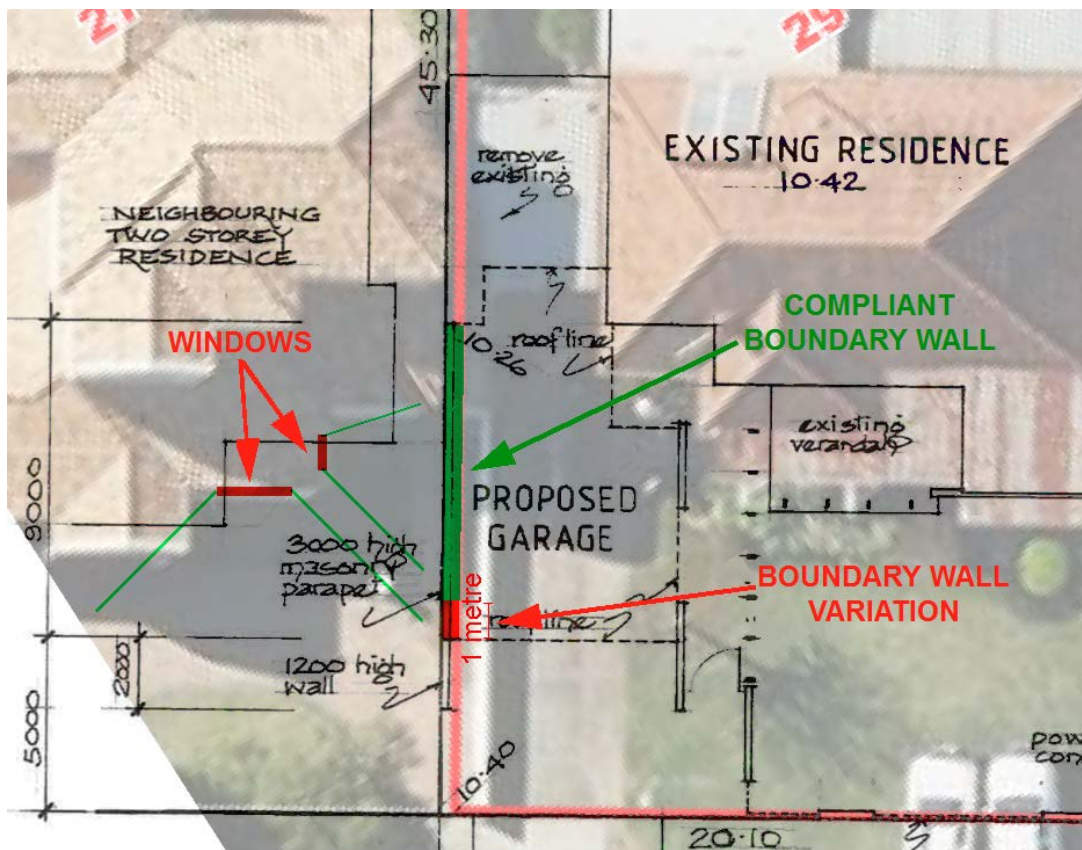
Proposed garage boundary wall marked relative to adjoining properties ground floor windows
